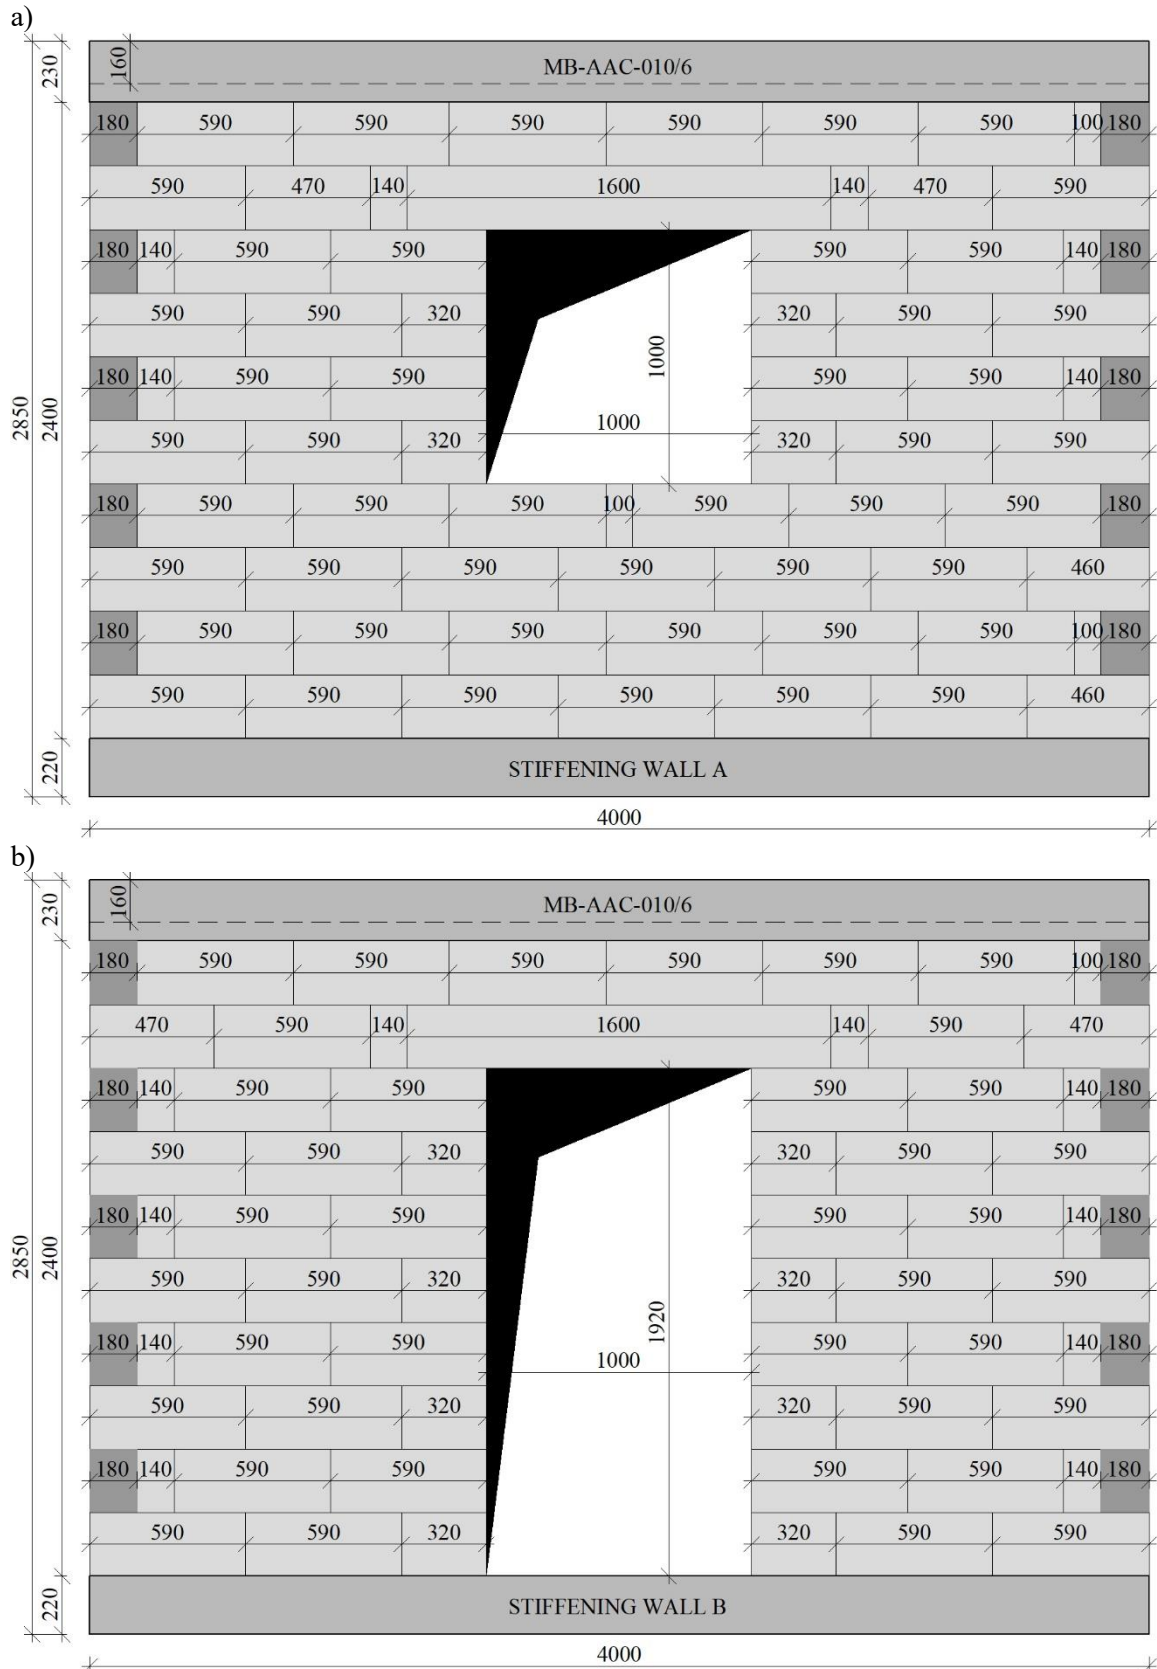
Design of the MB-AAC-010/6 model: a) stiffening wall A, b) stiffening wall B
